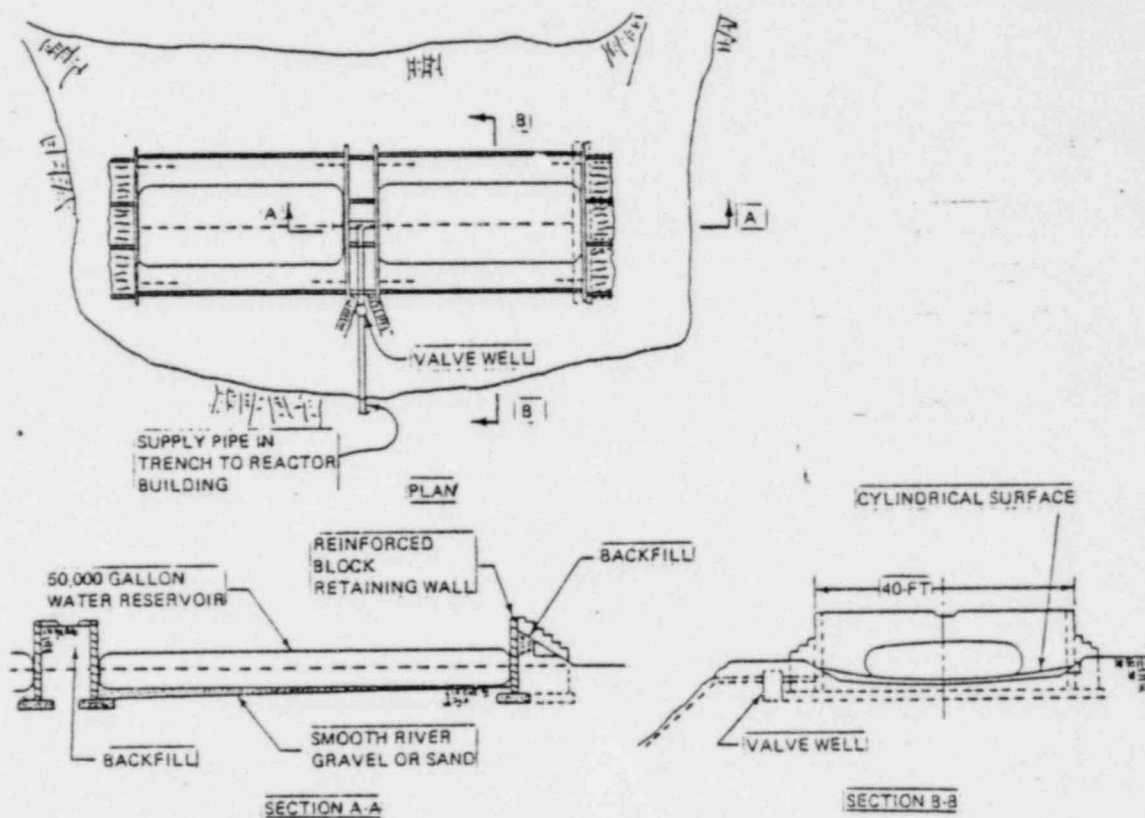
TYPICAL FFS RESERVOIR AND RETAINING STRUCTURE
